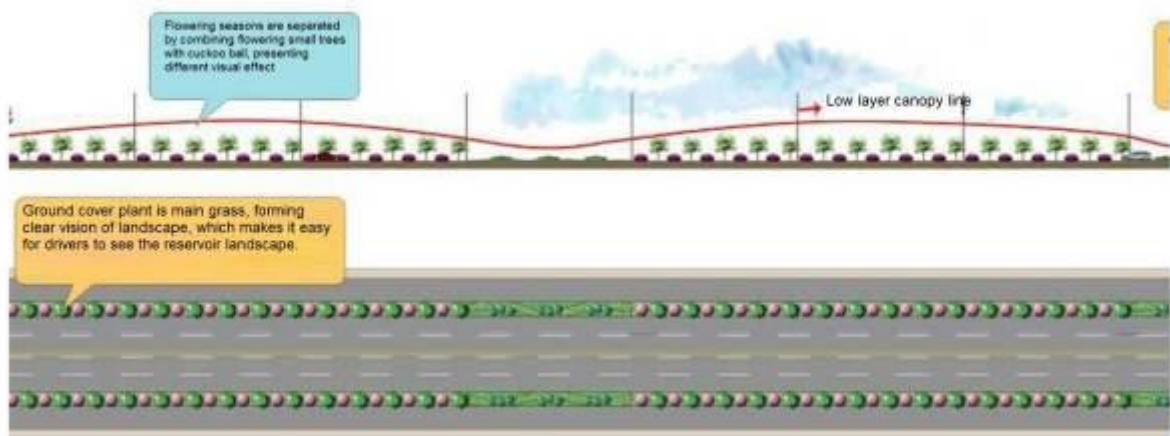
100m Standard Demonstration Section of Trunk Road Landscaping Works
